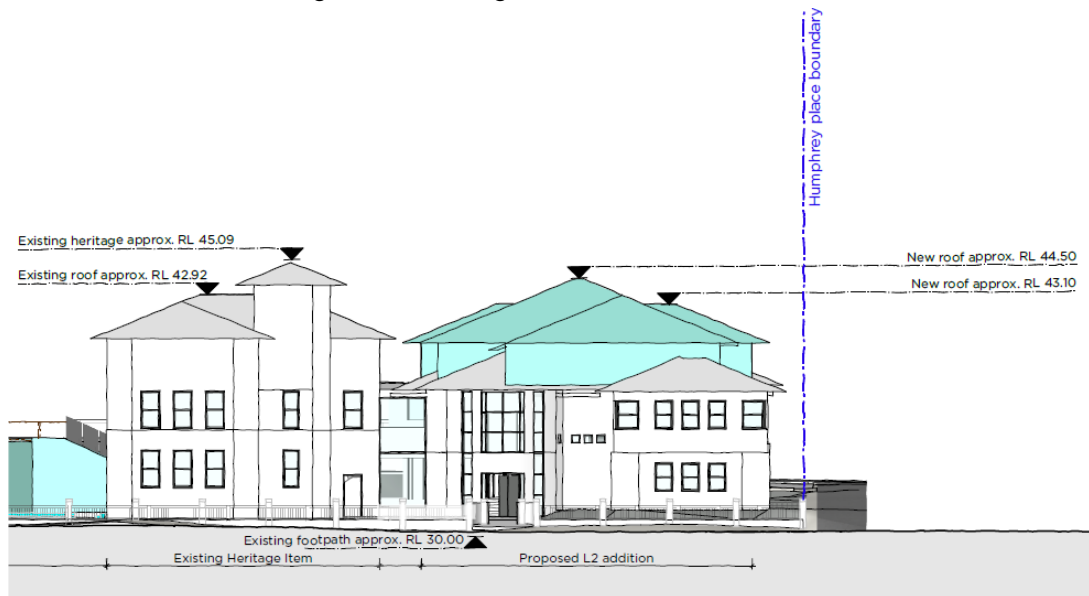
Junior Campus original building envelope (Source: Applicant's EIS)
